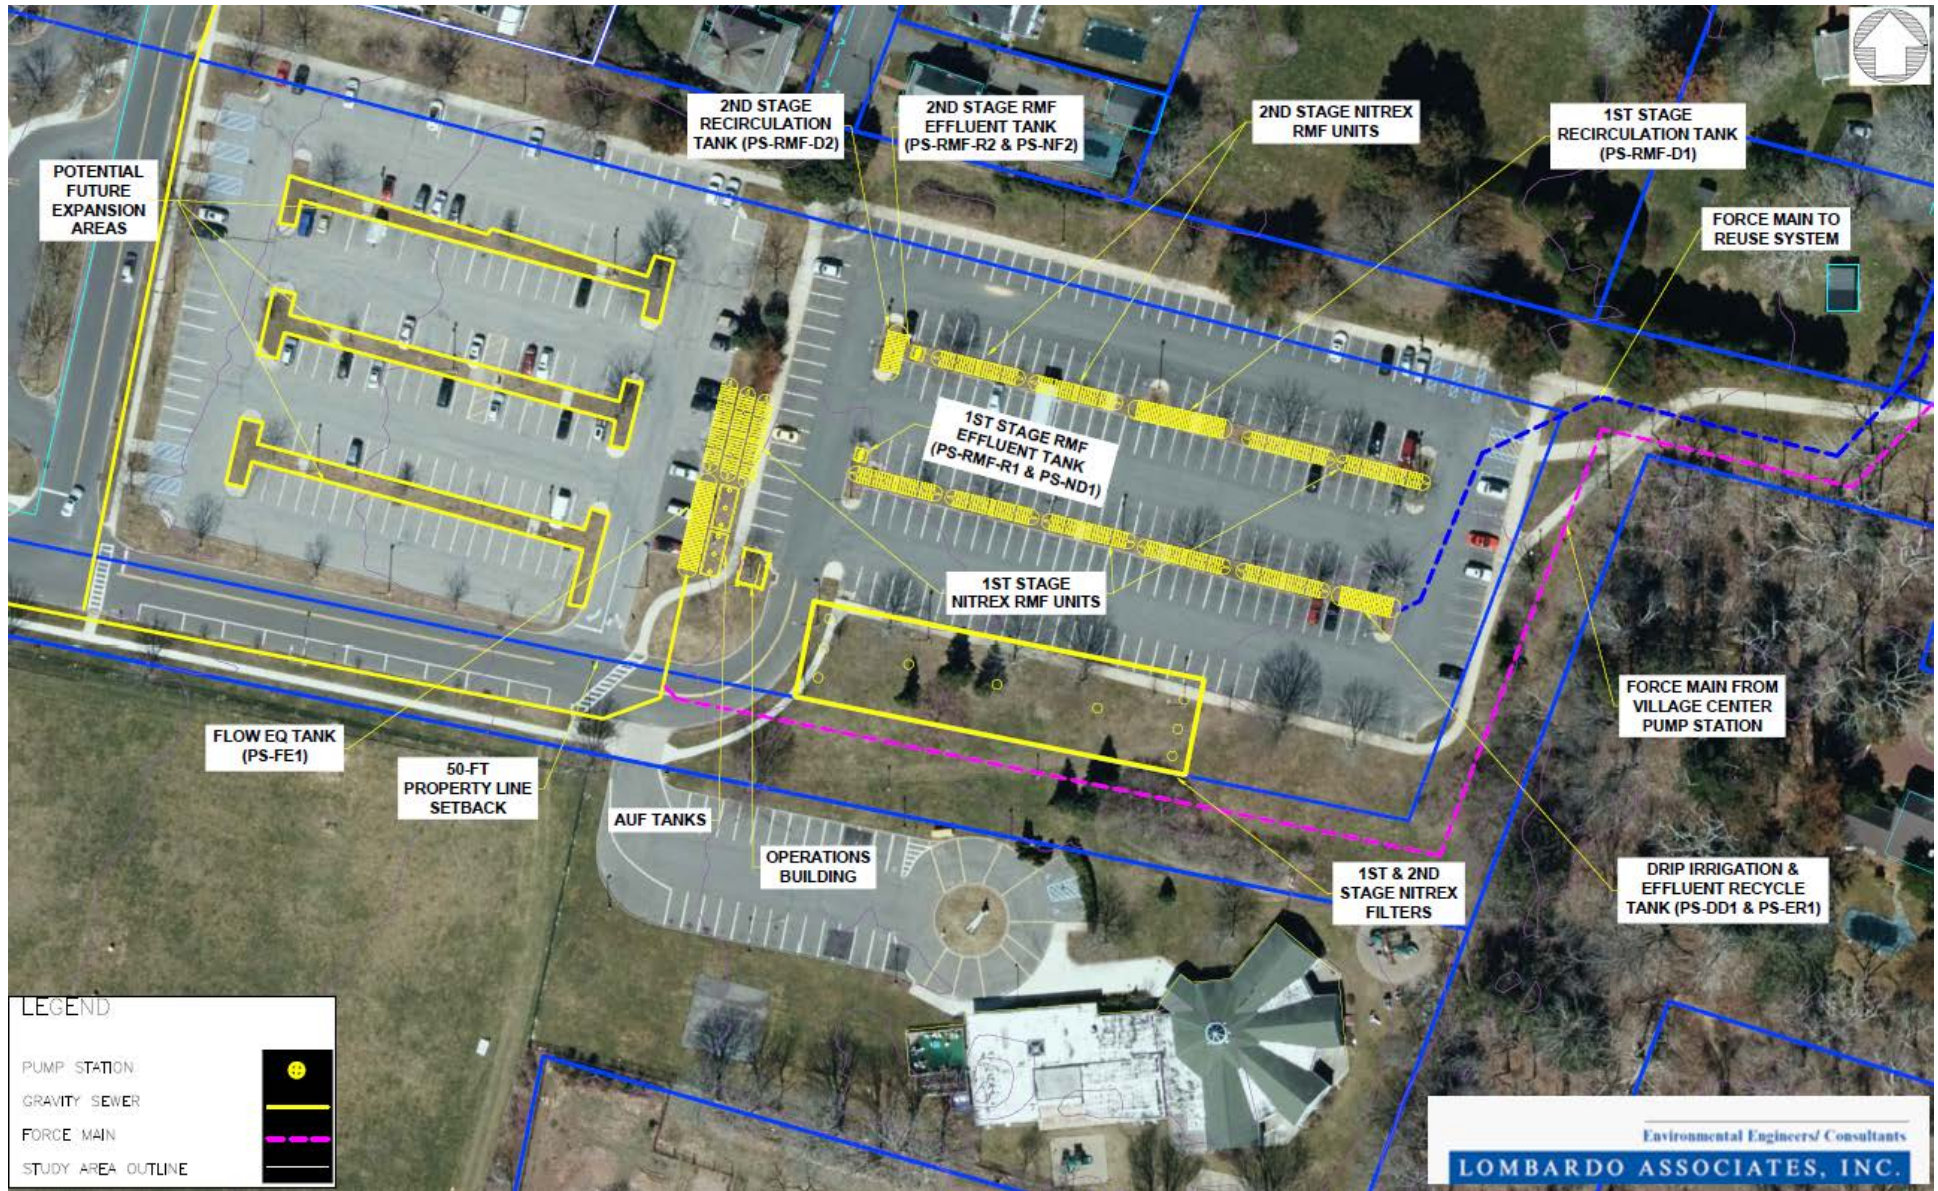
Proposed Water Resource Recovery Facility Layout
